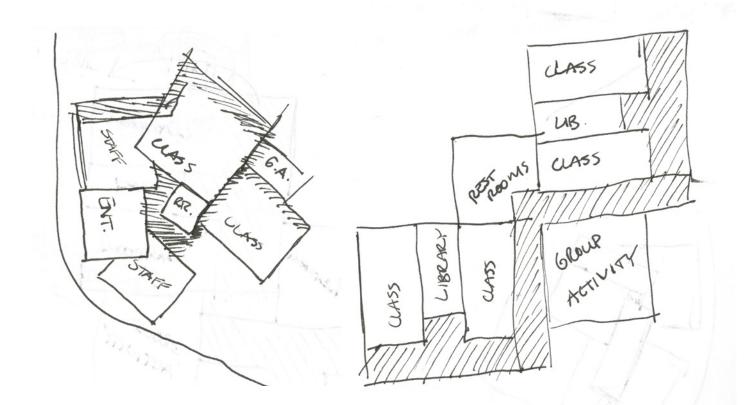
Spatial Arrangement Sketches 1 Hausladen, G. (2013). Spatial Arrangement Sketches 1. [Designer]
